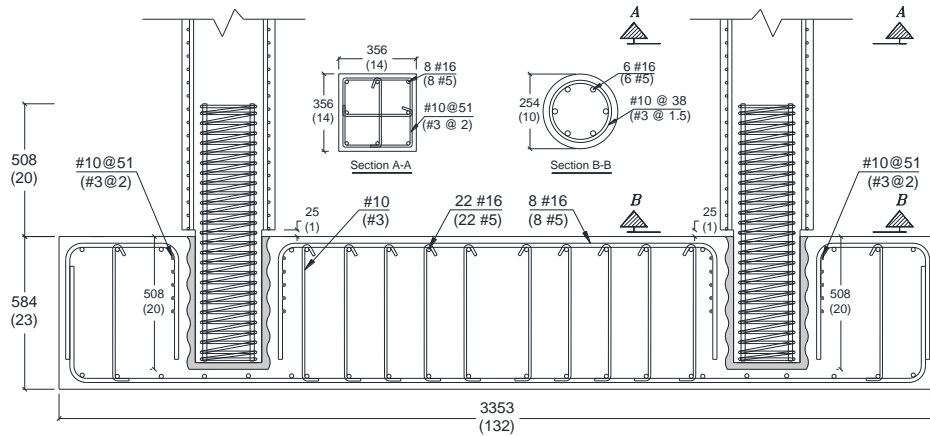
Details of the footing reinforcement of the two-column bent model [units are mm (in)]
